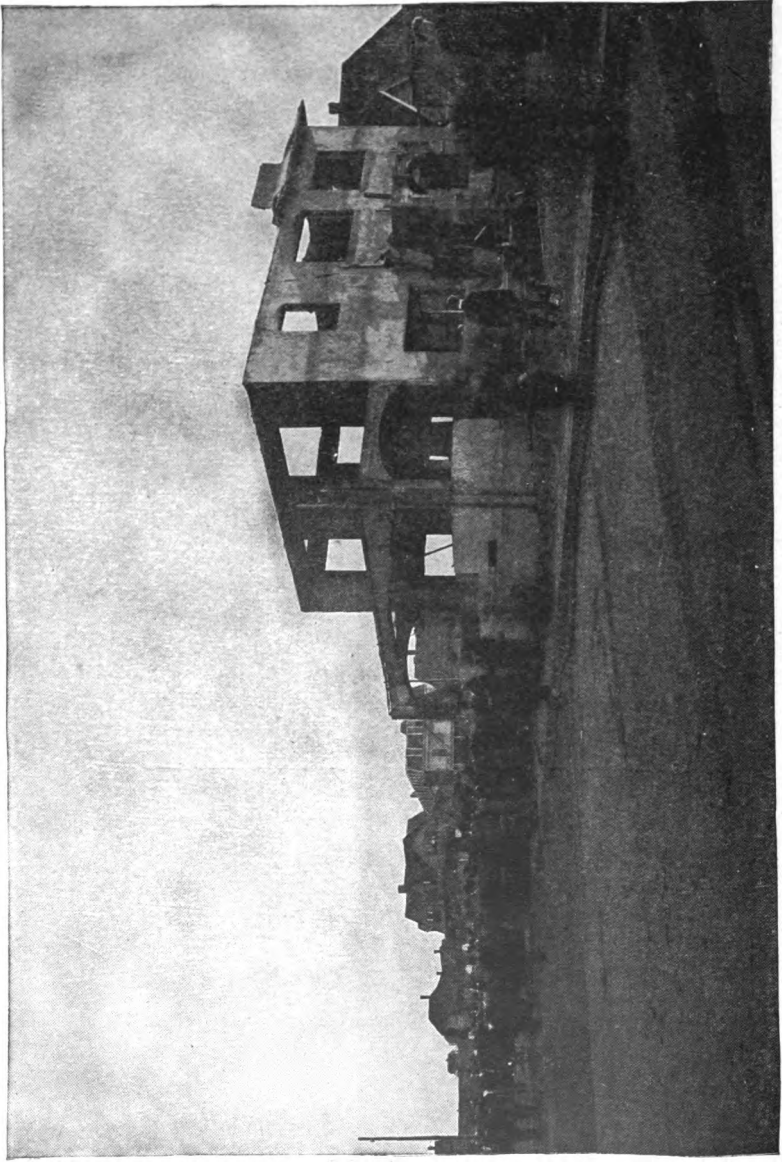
Winthrop Beach Cottage After the Fire. Concrete was Undamaged and Cottage was Rebuilt with Same Walls
